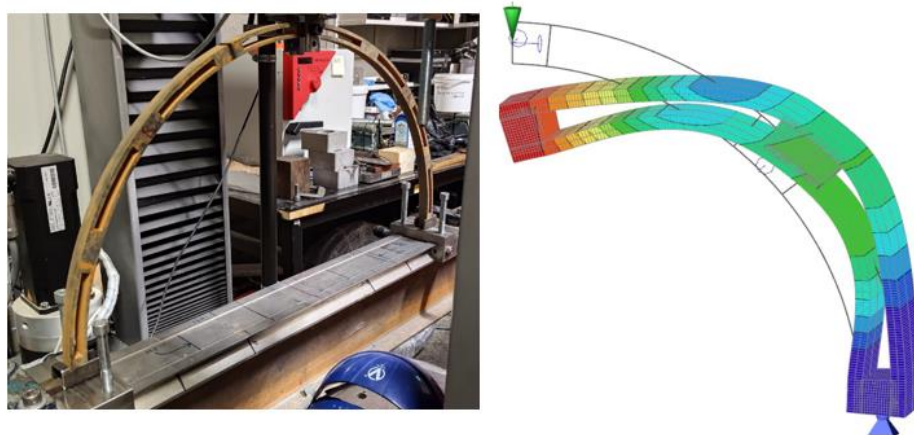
Secondary bending, tests on a two-layer beam assembly.
